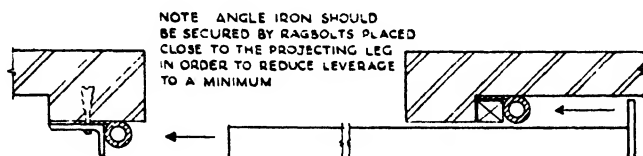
SIMPLE RUBBER TUBE SEAL TO SLIDING DOOR
